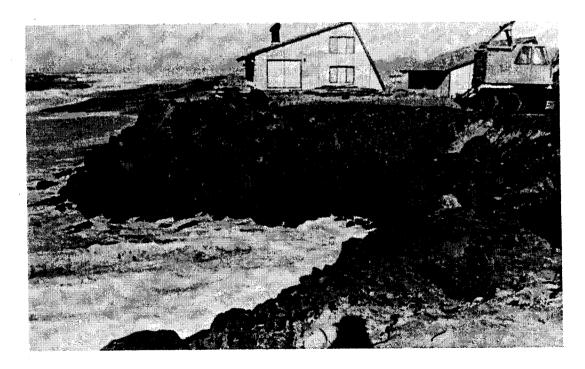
Close-up showing house on left side of above photo where riprap placed earlier at front of house was not sufficient to withstand later storms. Erosion continued to remove sand exposed at either end, requiring additional riprap.
